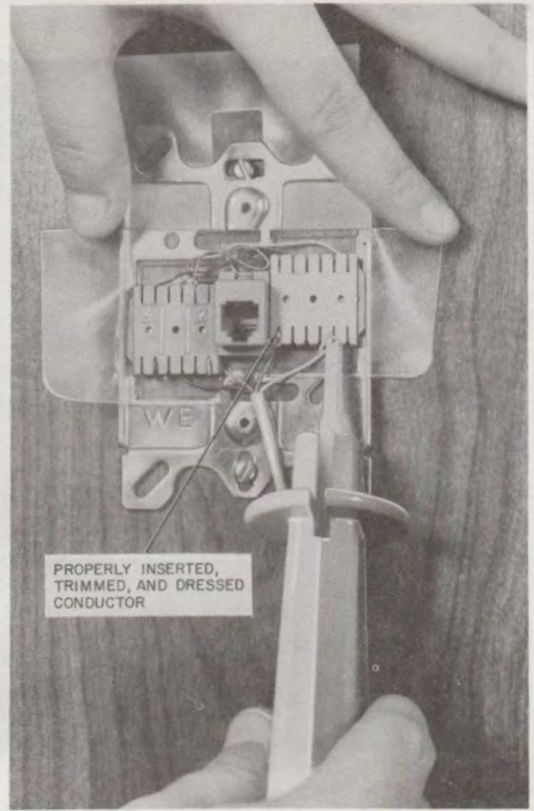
Terminating Wire With Lead Insertion Tool in 630A4 (With New Bracket)
